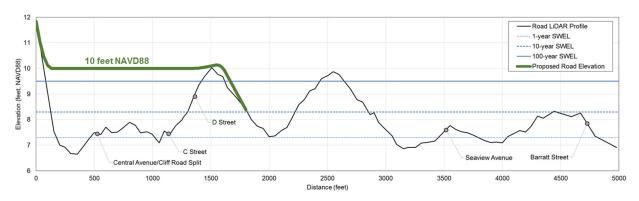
Existing road elevation (black) and potential first phase of road construction (green) along Cliff Road South and Central Avenue.
